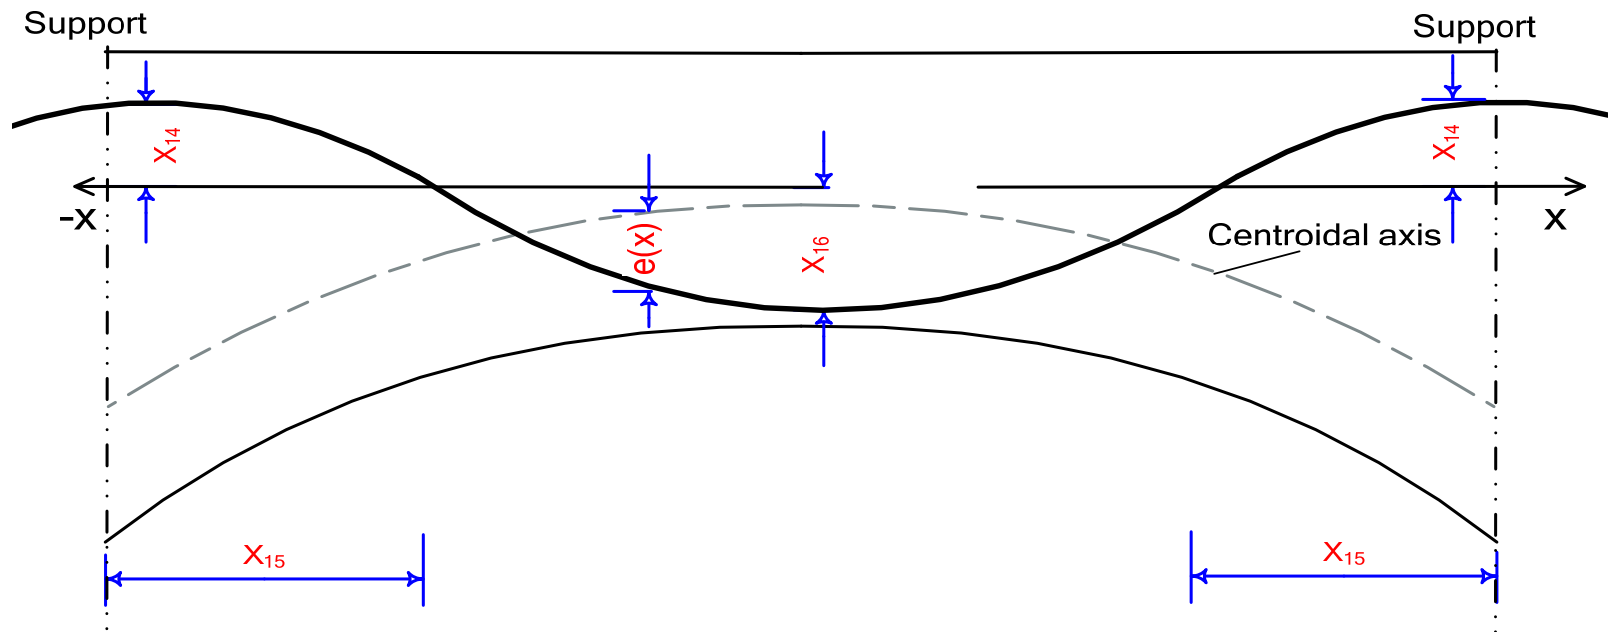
Design Variables in Interior Span of Continuous Bridge girders
